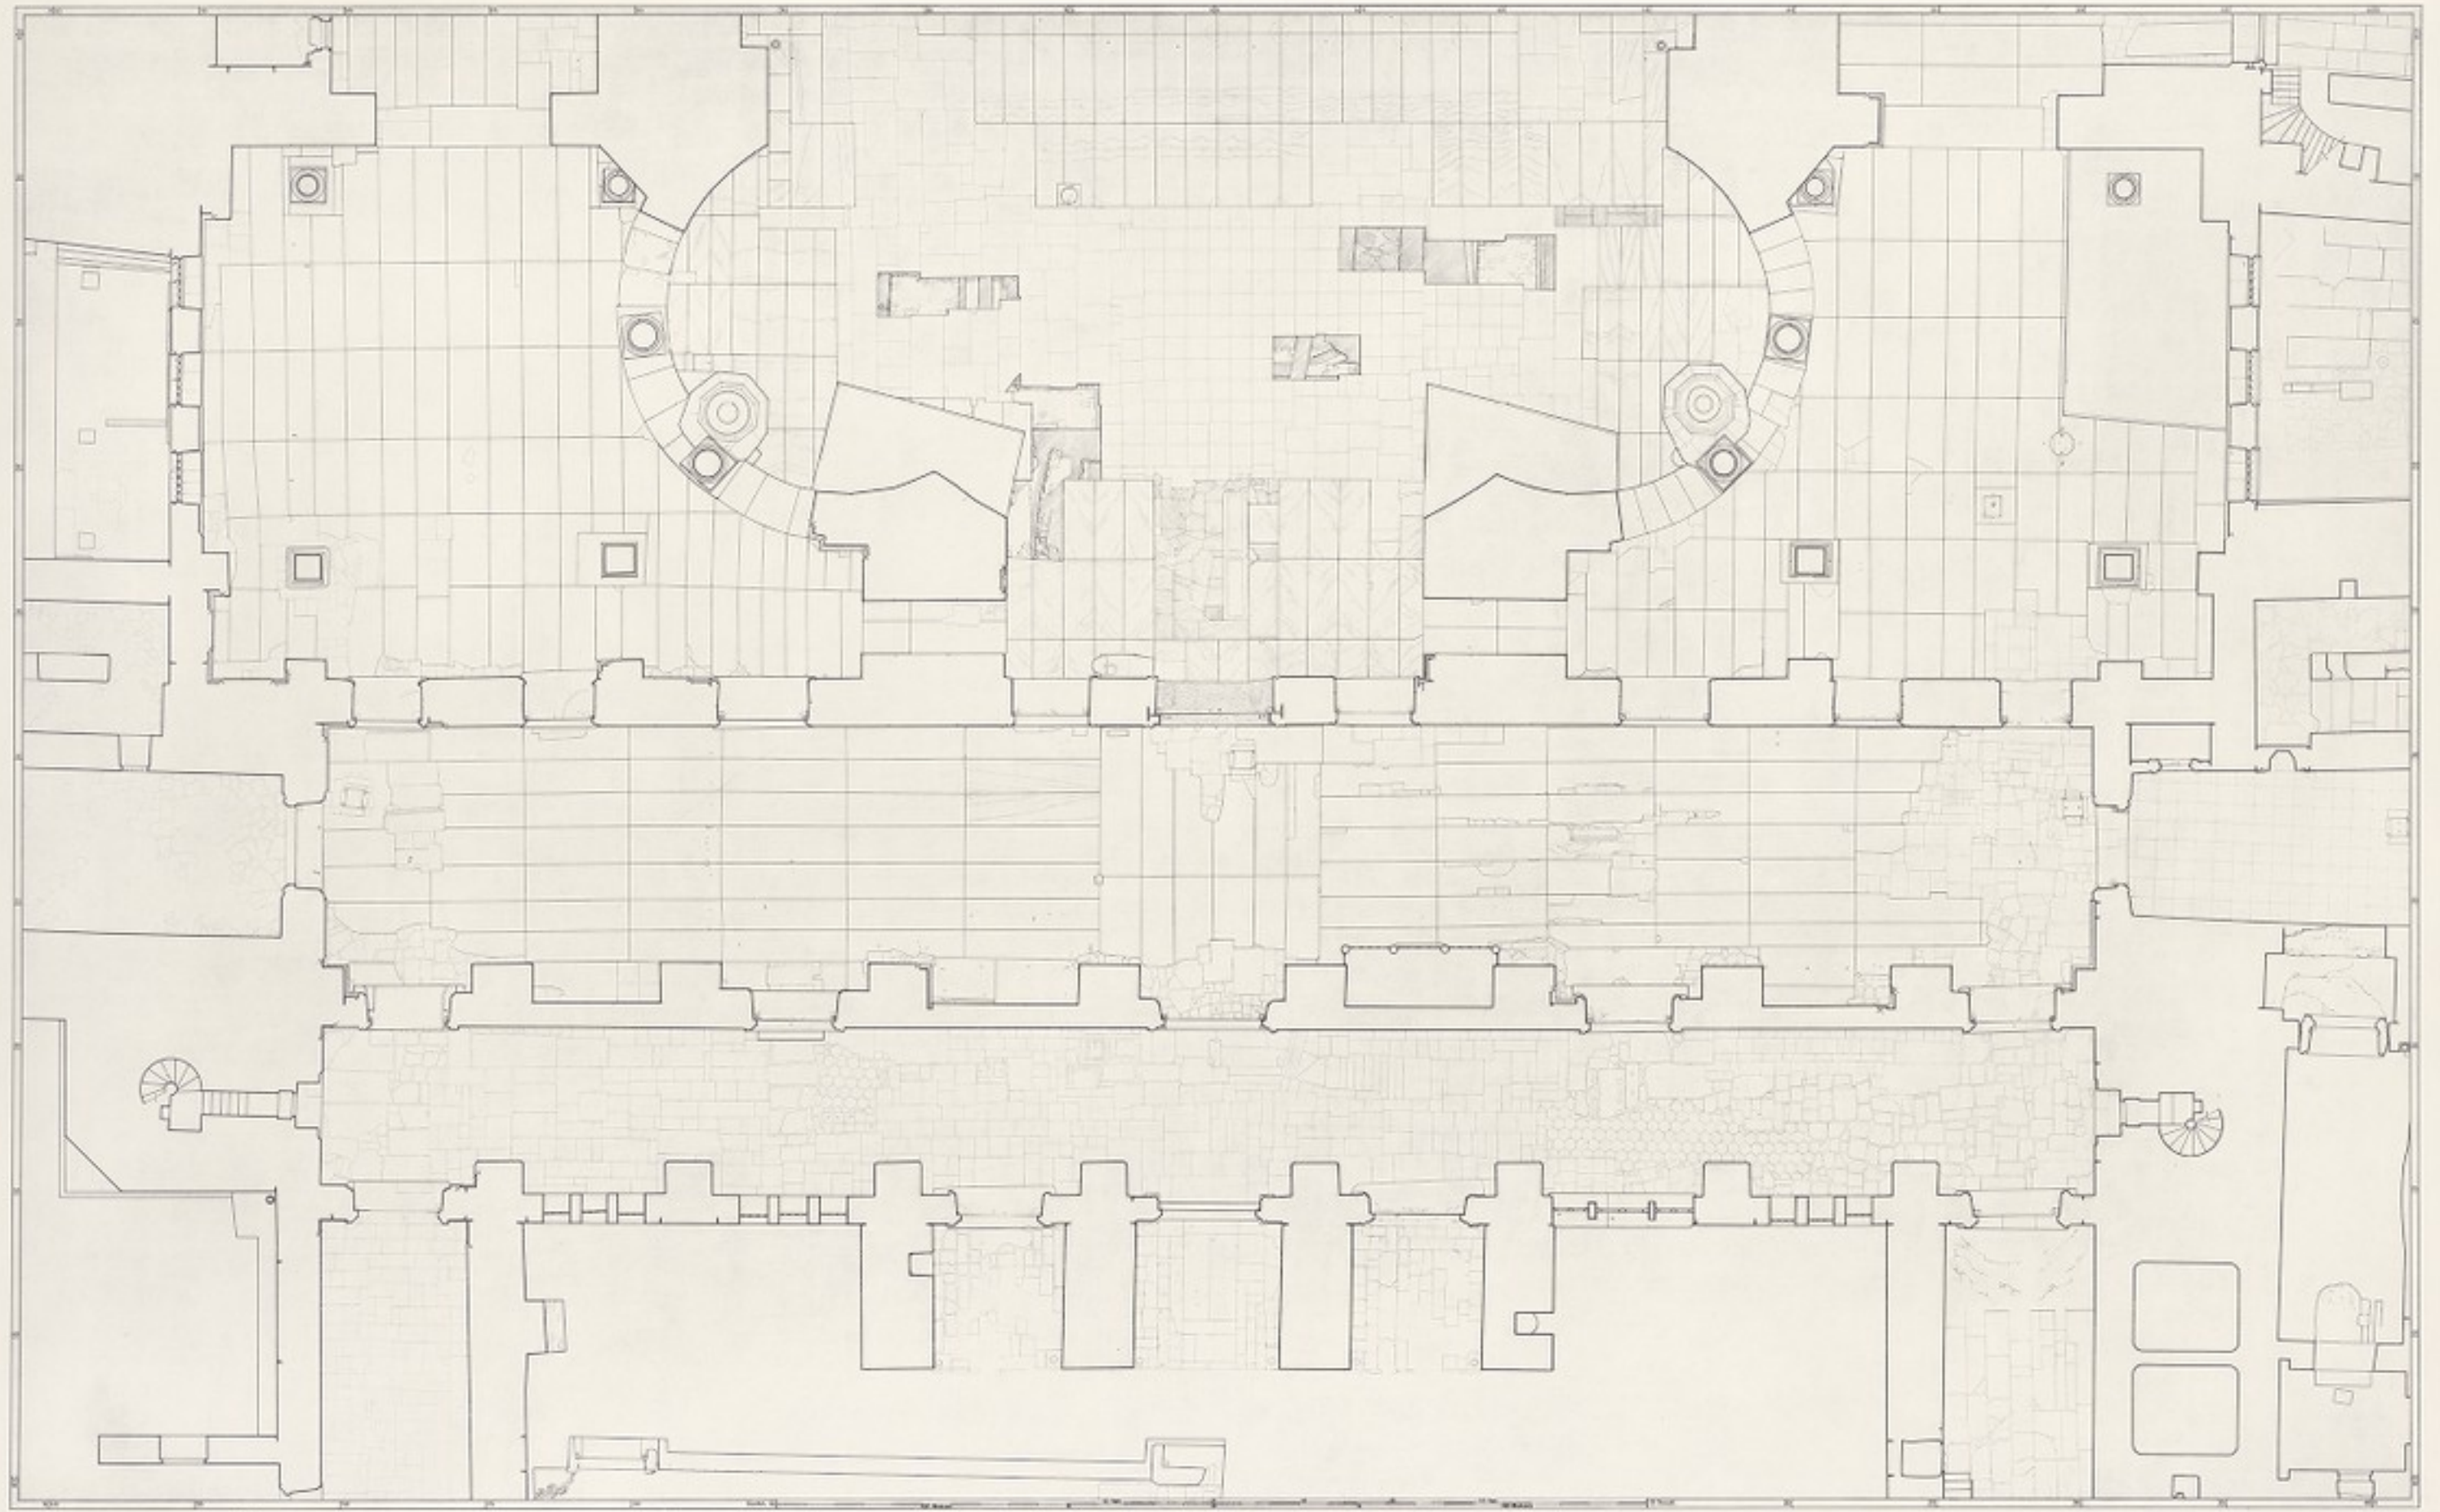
PLAN AT GROUND LEVEL, WESTERN AREAS:
